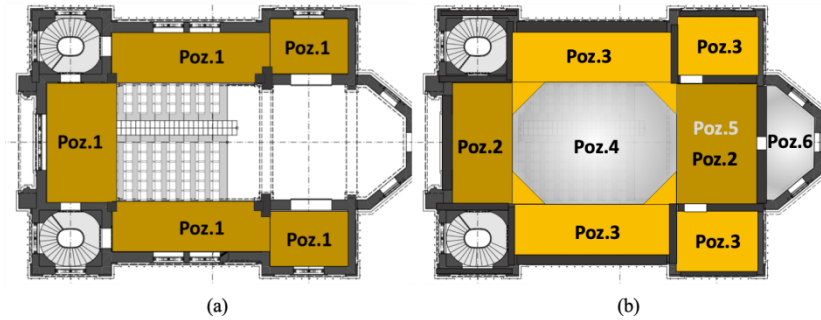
Added horizontal diaphragms on first floor (a) and attic level (b) and timber domes on the attic level (b).
